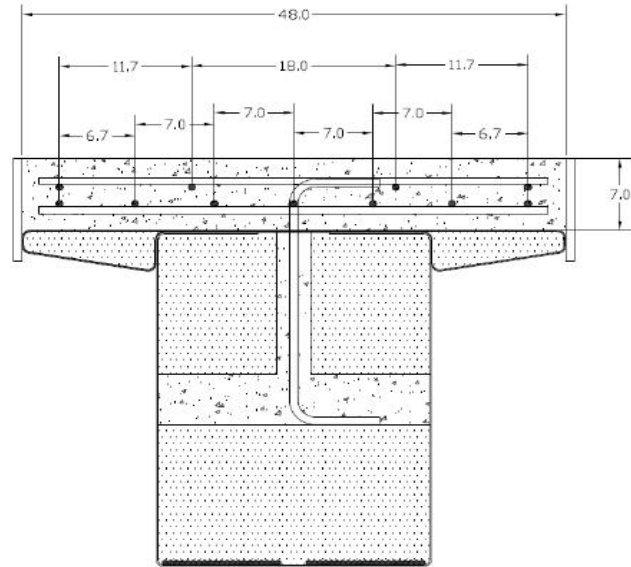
Typical cross-section of the HCB tested in AEW lab (Snape and Lindyberg, 2009)
